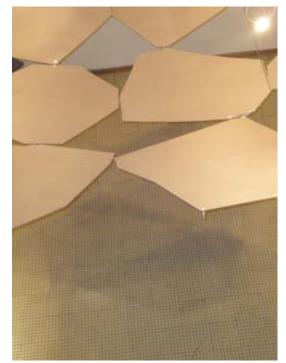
View from above ceiling model showing shadows created on the floor surface underneath (Cable grippers,2010)
